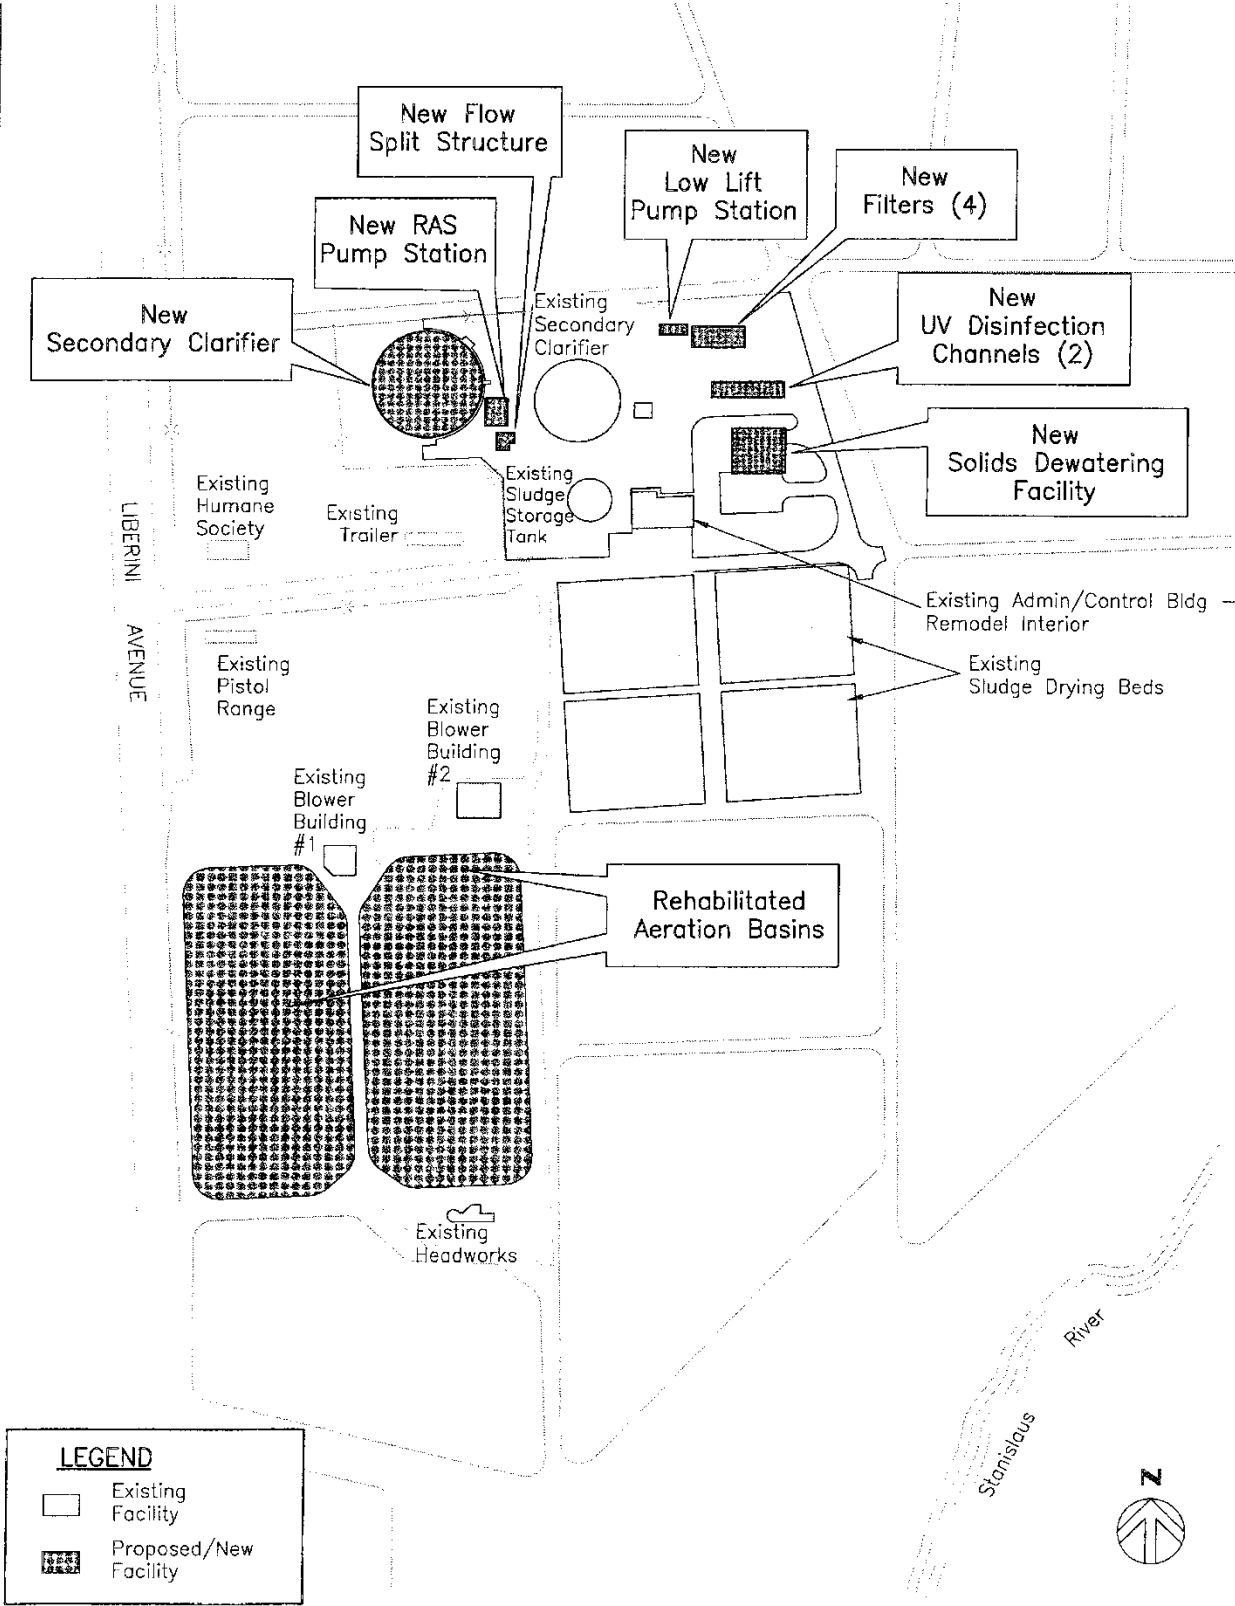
Existing Waste Water Treatment Plant Site Layout
